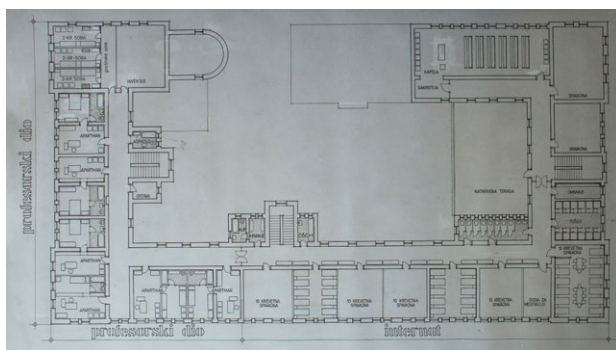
The Convent of Saint Bonaventure, Visoko: second floor plan, segment of the project for extension and reconstruction done by Vinko Grabovac in 1985 (Archive Visoko)
